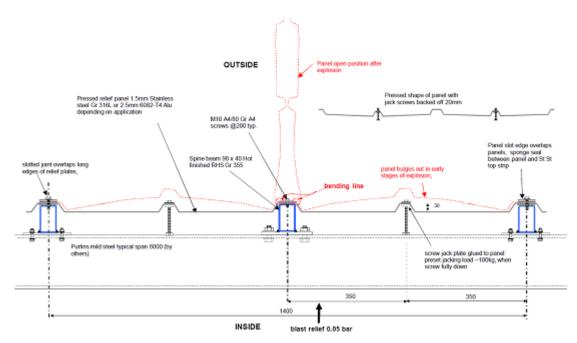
Transverse section through wall/roof cladding for 1400mm panel pitch.
